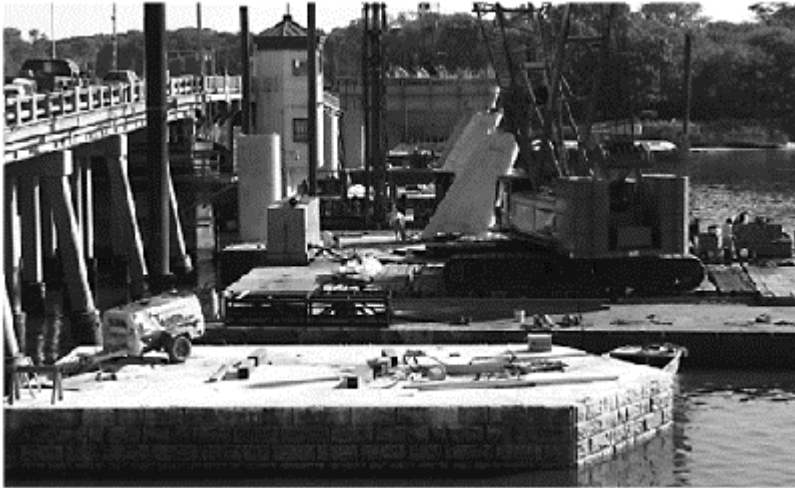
Crews work on multiple piers at the same time. Piers are shown in various stages of completion.
